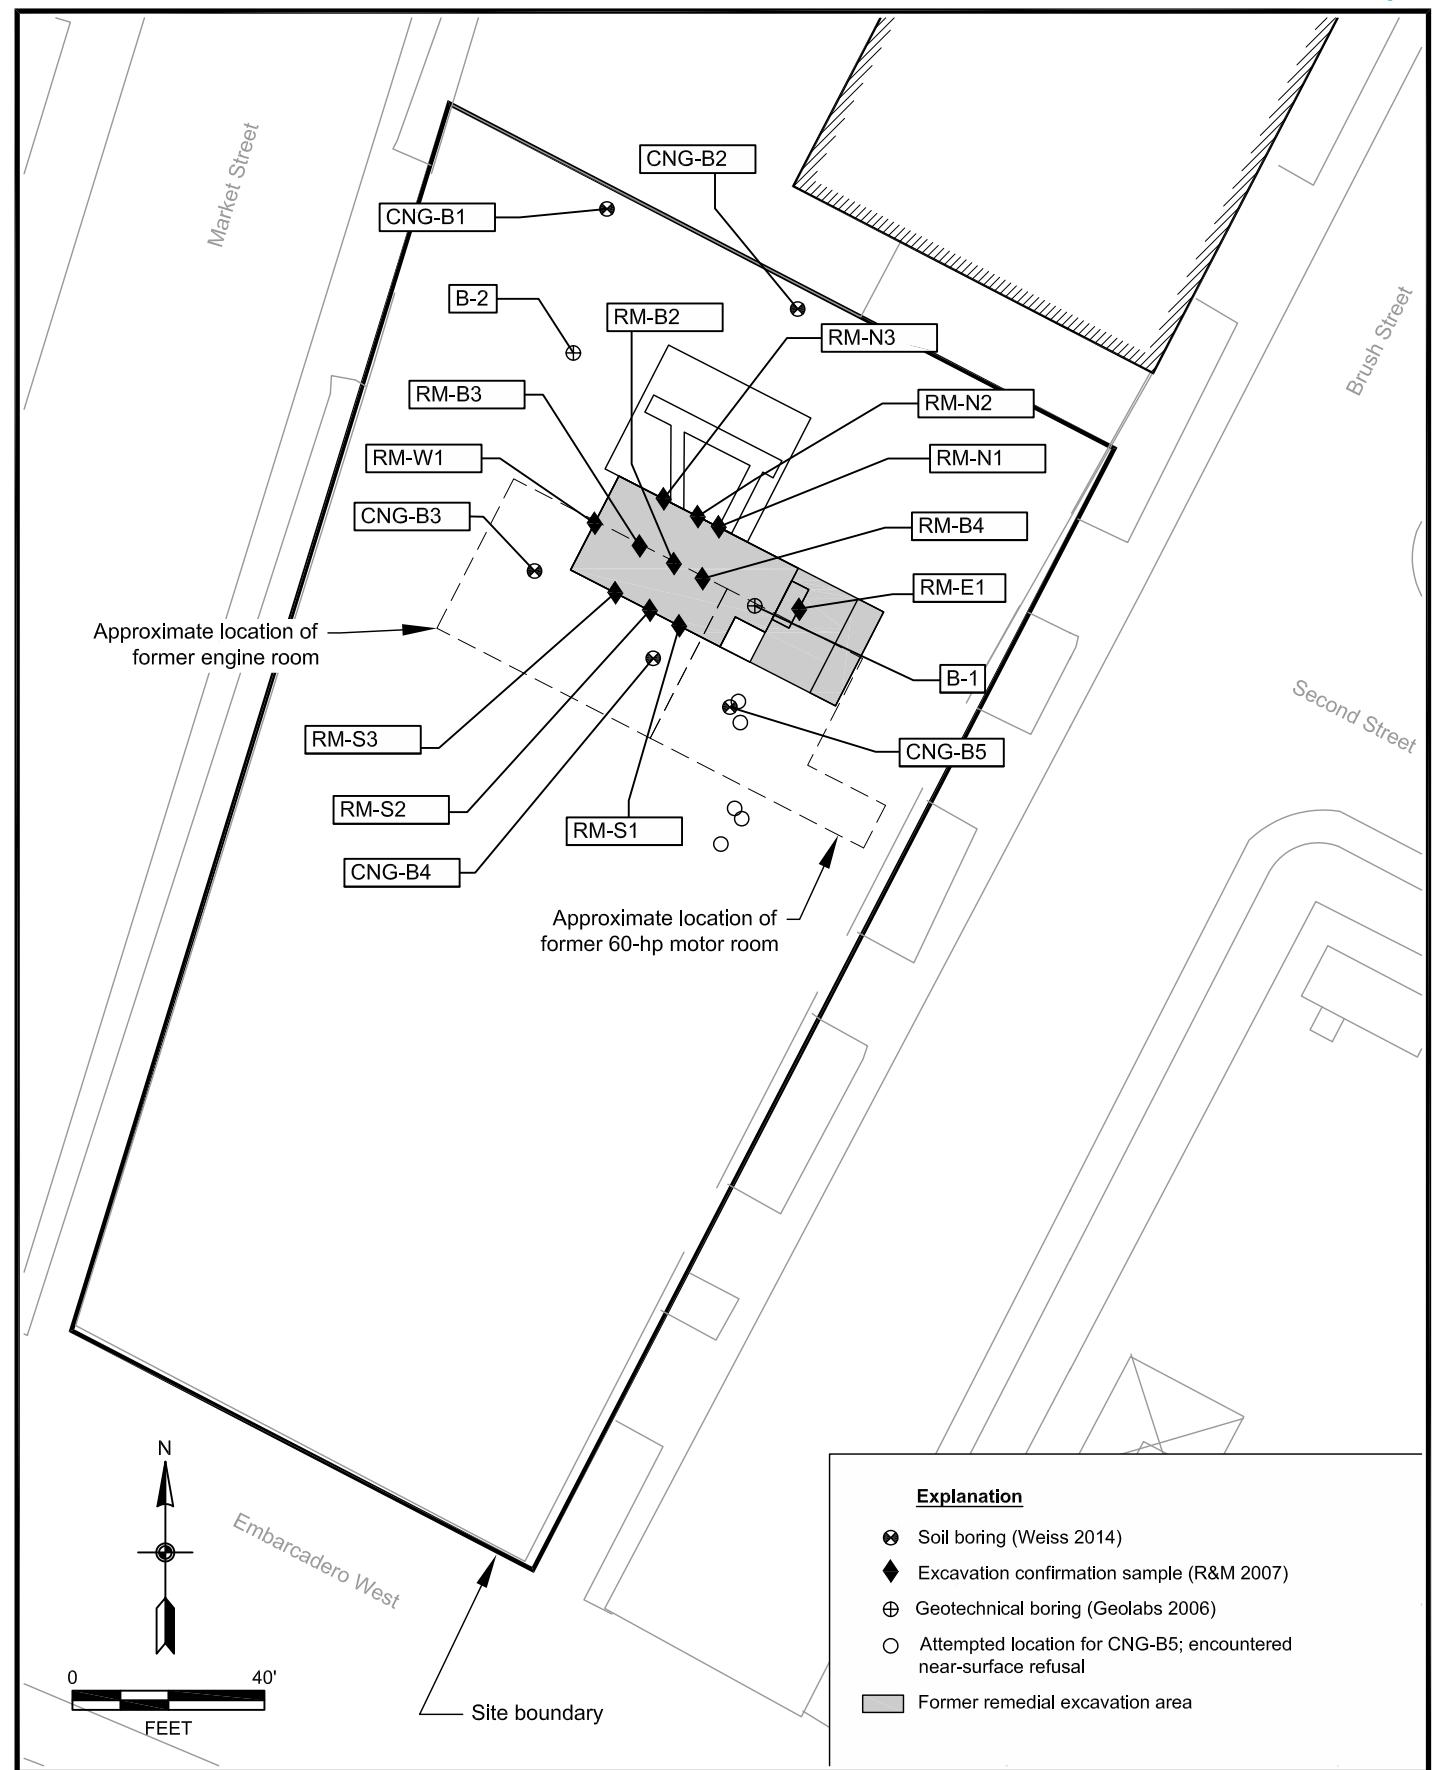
Boring Locations, CNG Fueling Station, 205 Brush Street, Oakland, California
